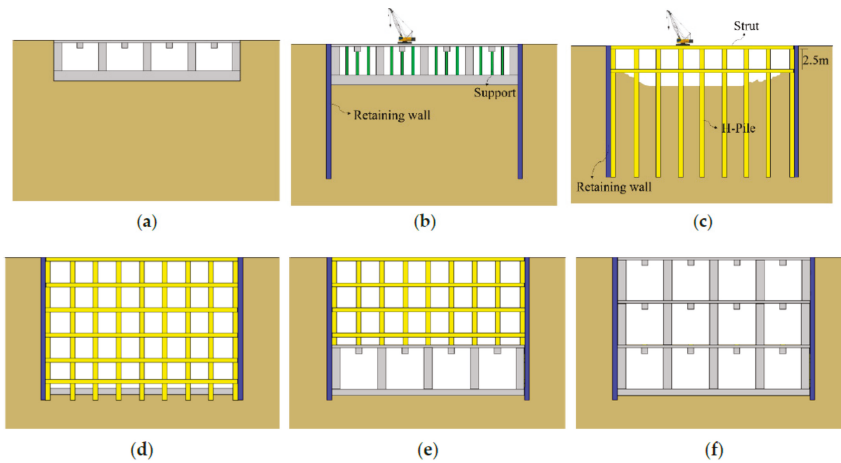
Vertical extension process for existing underground spaces using the bottom-up method (from a building with one basement floor to three basement floors). The process is listed as: (a) Existing underground structures before works; (b) Installing of earth retaining walls after reinforcing the existing structure; (c) Construction of temporary struts and H-piles after demolition of the existing structure; (d) Foundation construction after installing of struts up to base; (e) Construction of a structural frame (from B3 to B1) and dismantling struts; and (f) Completion.
